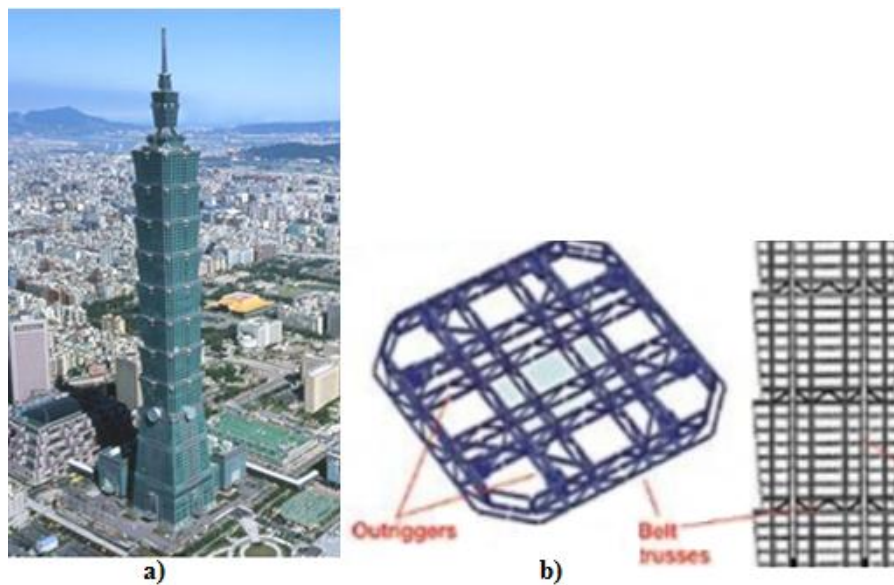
a) Taipei 101 building (adapted from [24]) and b) schematic design of outriggers and belt trusses of Taipei 101 (adapted from [25])
